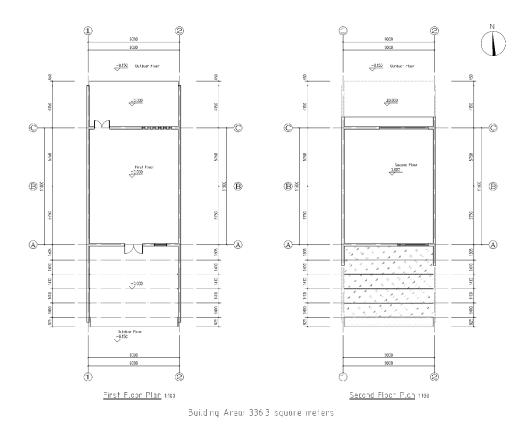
The First Floor Plan and Second Floor Plan of Building (Drawn by the author)
